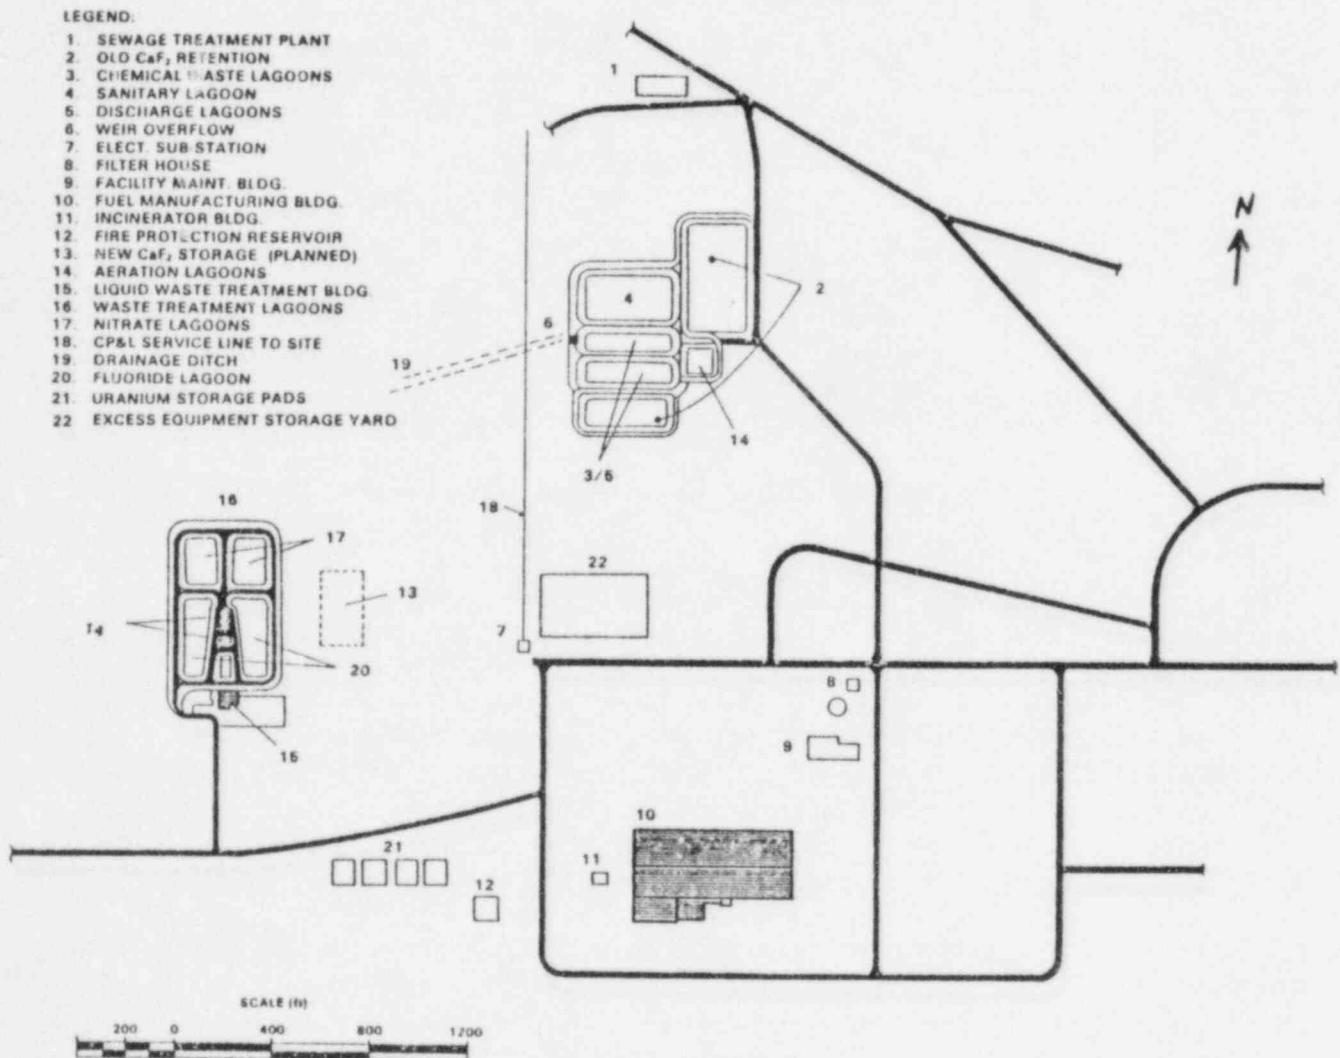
Reference U-Fab Plant Site Plan
